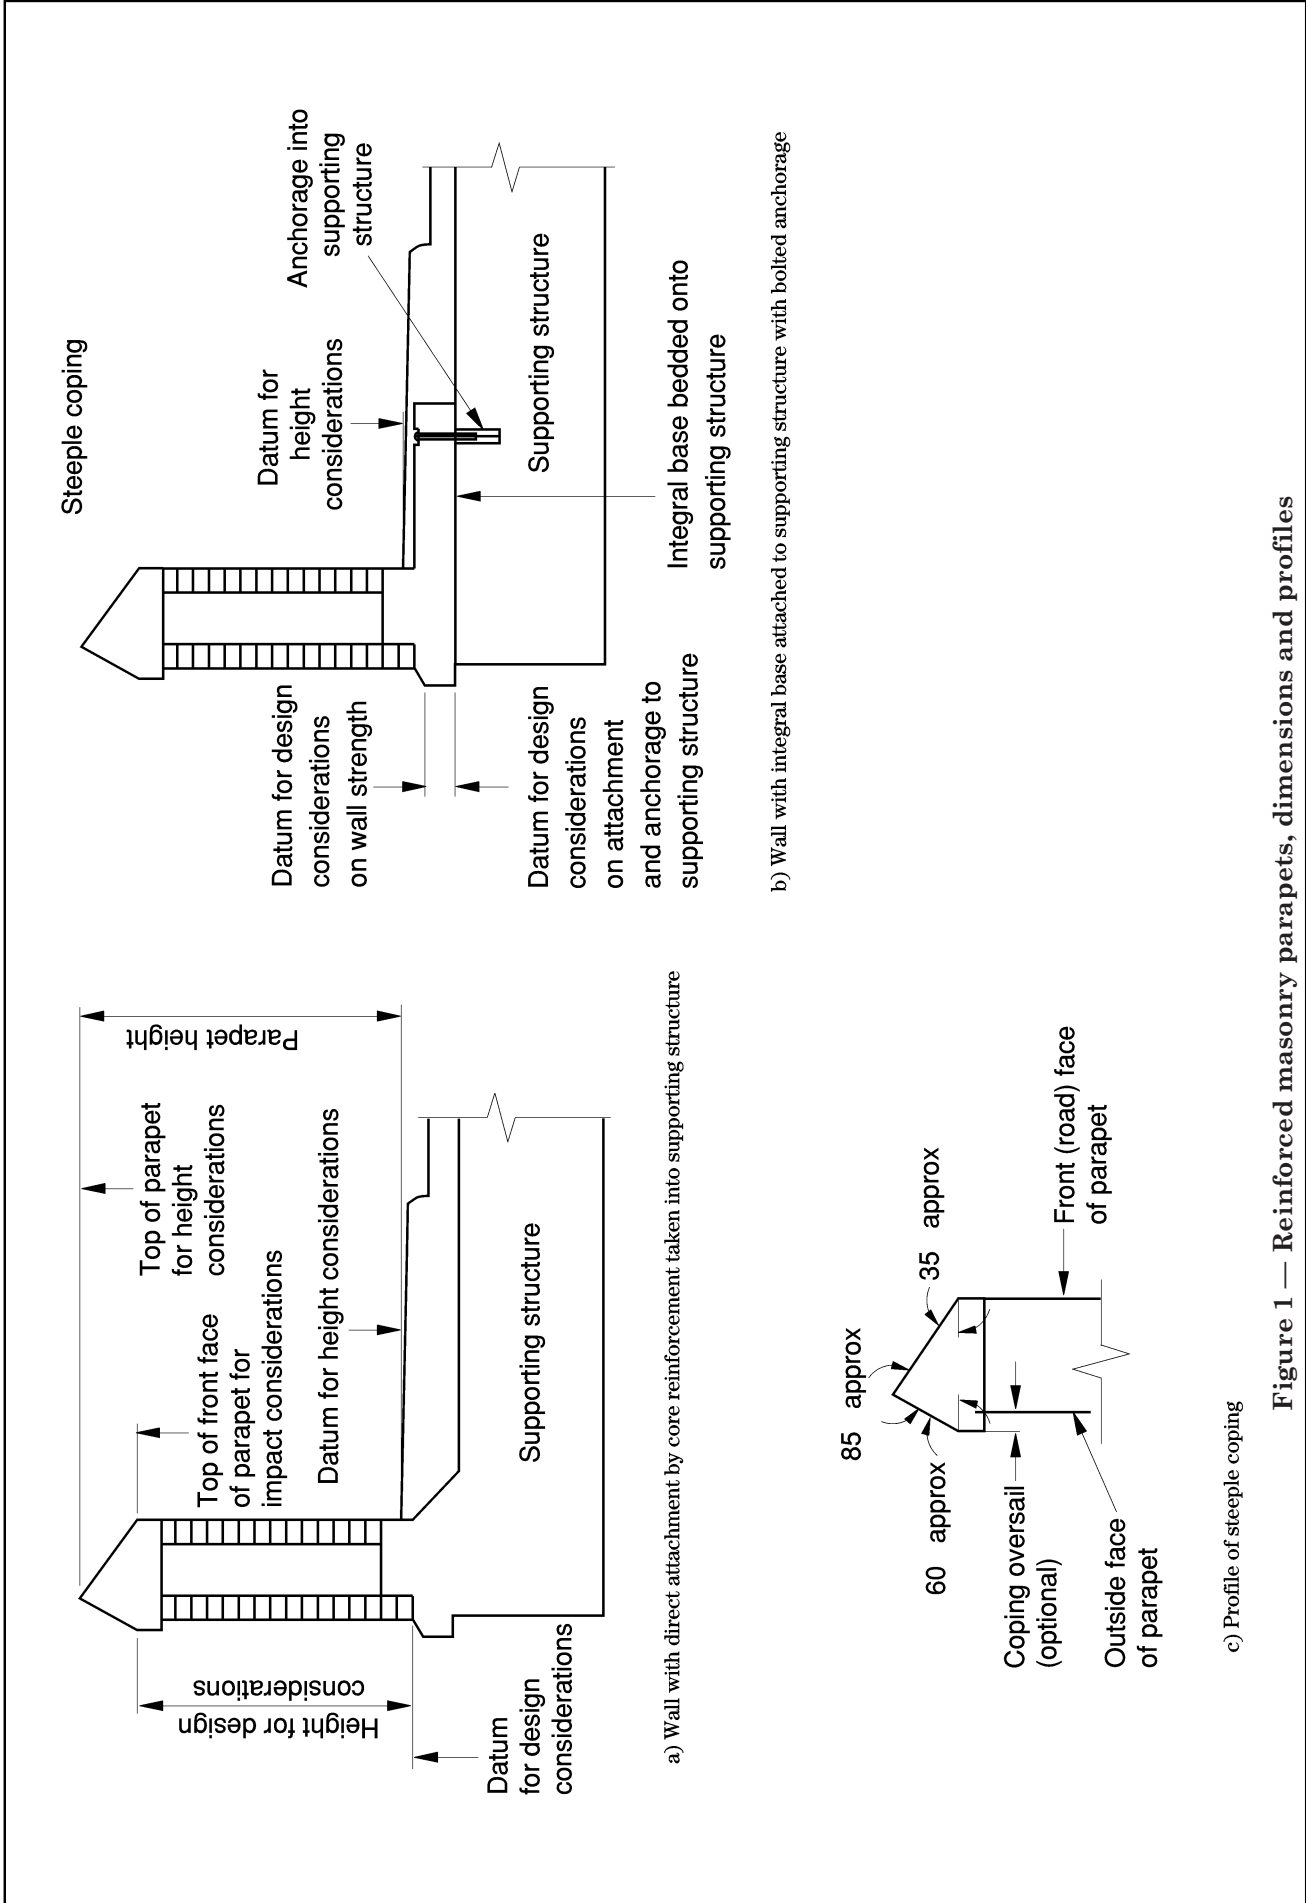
Reinforced masonry parapets, dimensions and profiles
